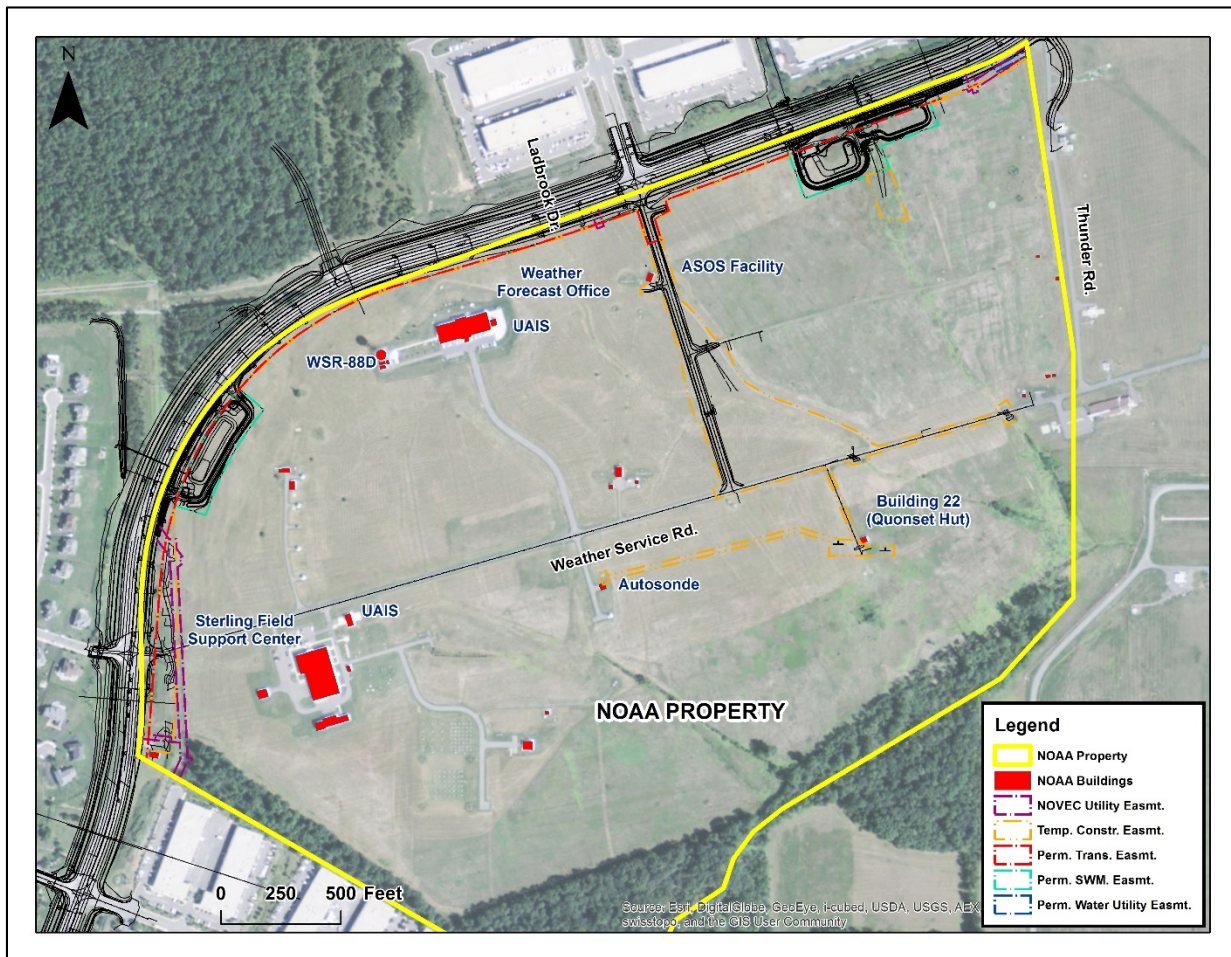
Proposed VDOT Route 606 Reconstruction Project on NOAA Property
